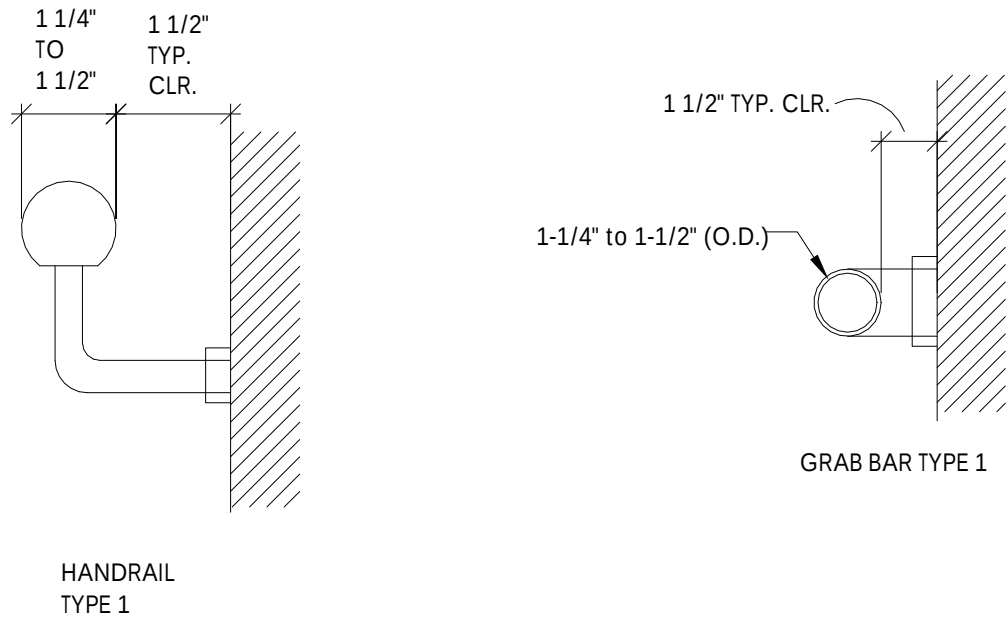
HANDRAIL & GRAB BAR PROFILES
